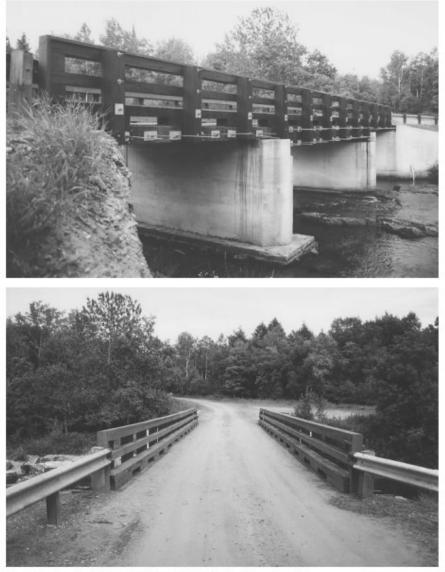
Completed Big Erick's bridge: side view (top), end view (bottom).
